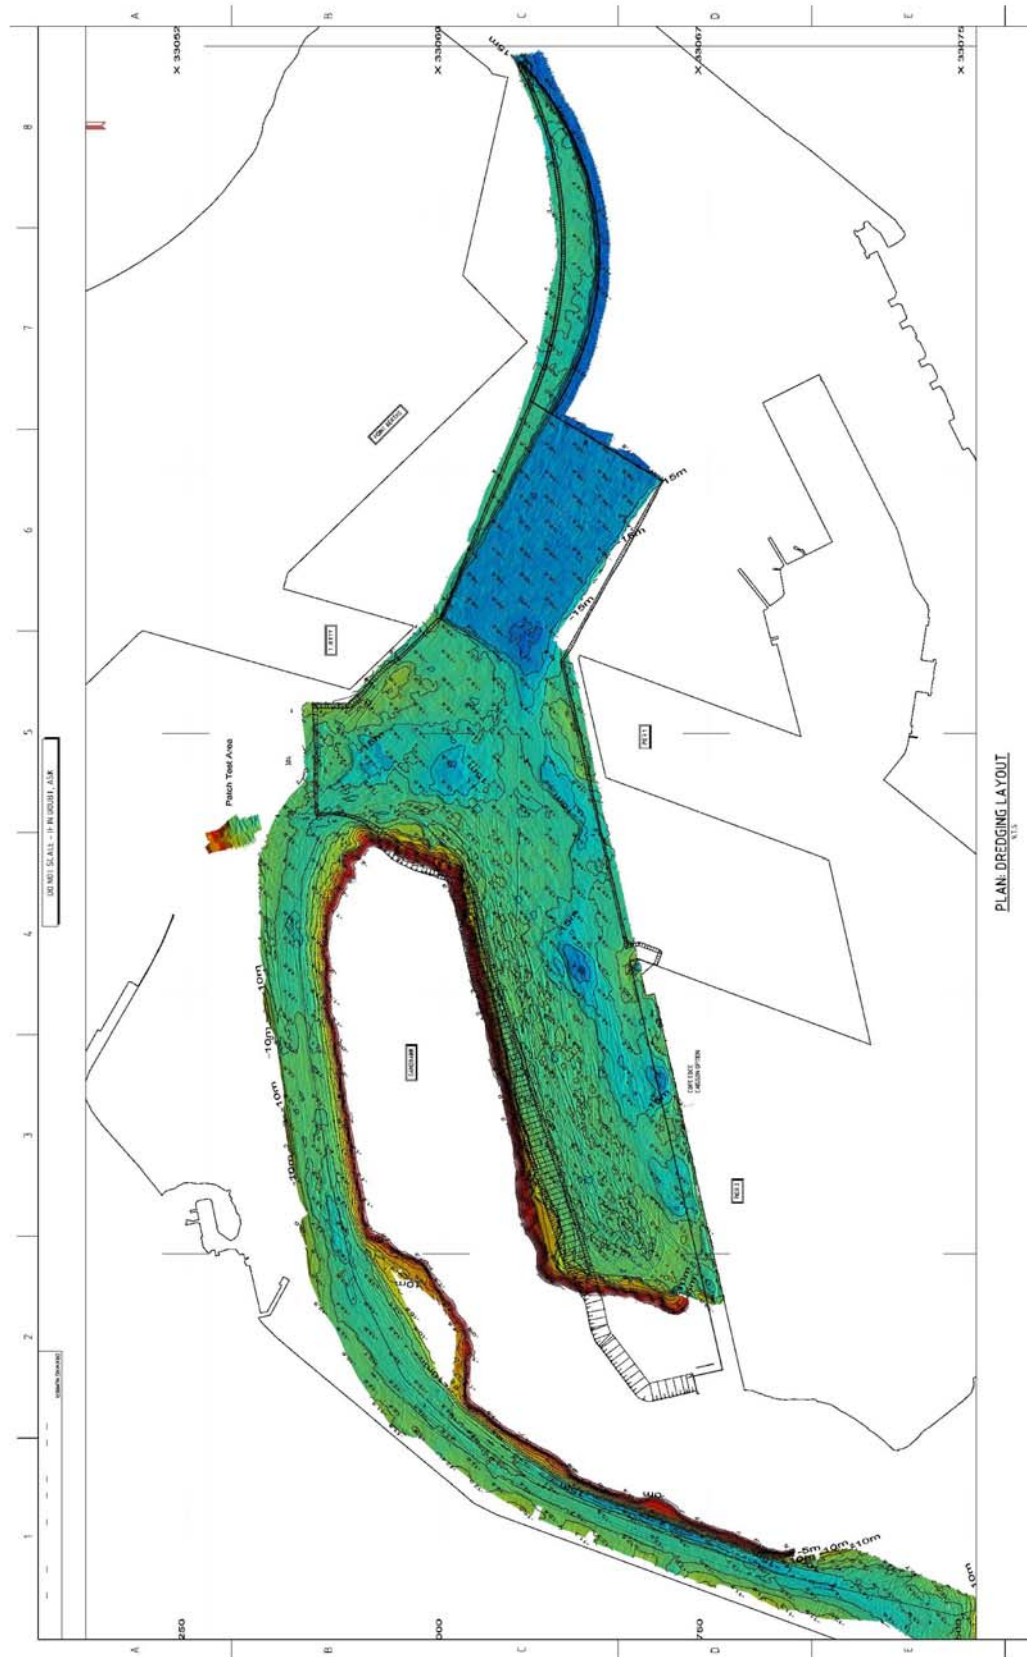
Option 3-D (Central Sandbank Proposed Extension infill shown in Figures 1 and 2g)
